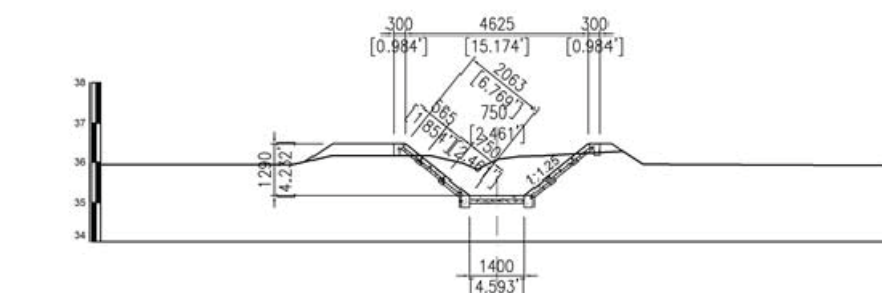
Proposed Distribution Canal Slope with Cement Brick Lining for Wegyi Irrigation System
